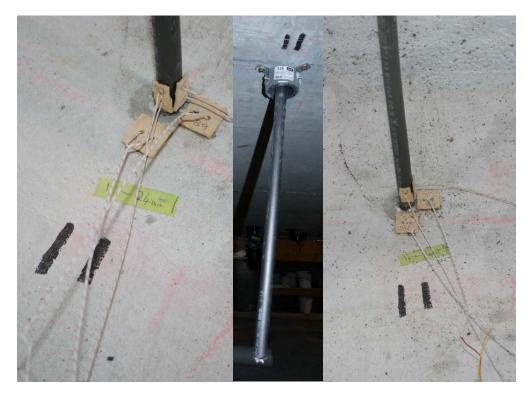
Specimen 12, left to right, unexposed, exposed and unexposed post test
